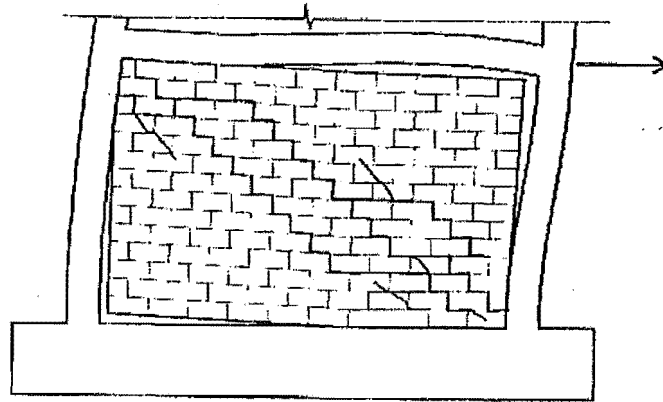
Shear cracking along the mortar joints, stepped cracks
